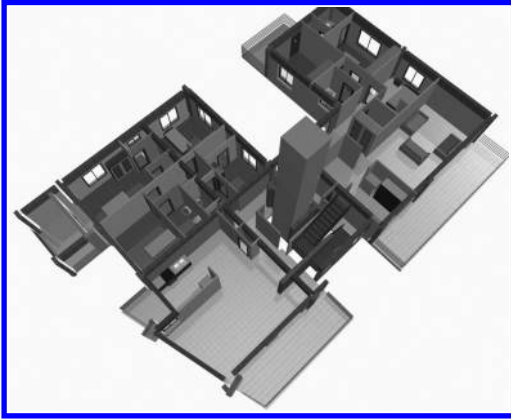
3D BIM of case-study building floor with structural, non-structural components contents in undamaged state.
